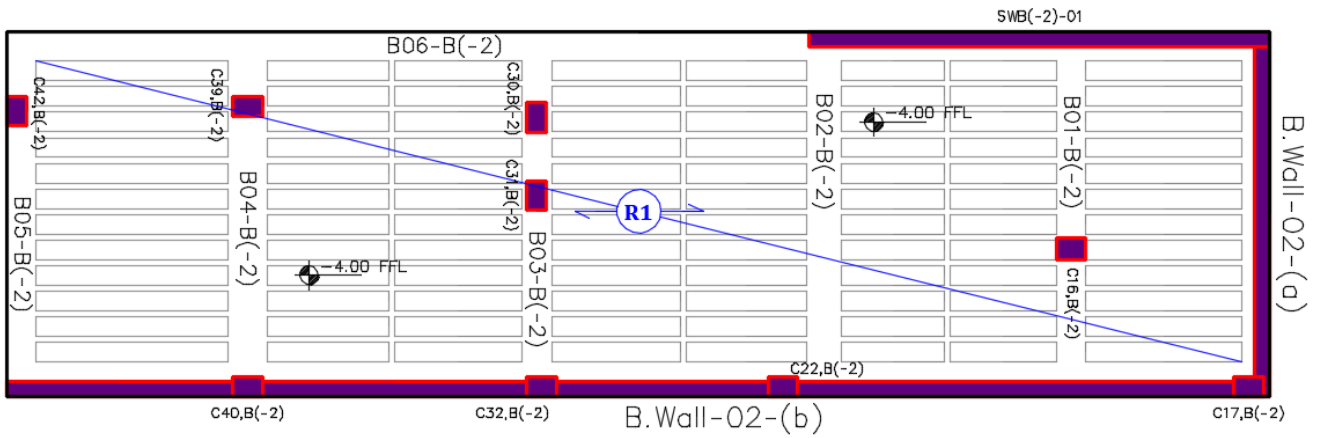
Rib (R1) - Basement (-2) Floor
